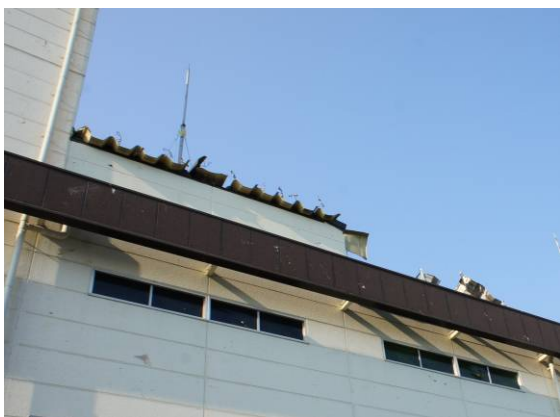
Damage of roofing materials Photo 43 Scattered roofing materials
